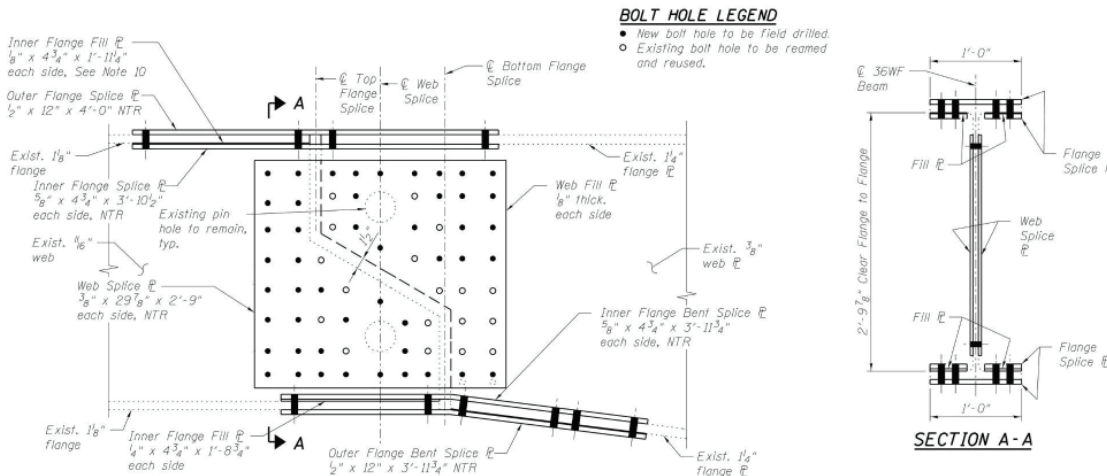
Example of a pin and hanger assembly made continuous with girder splice plates
